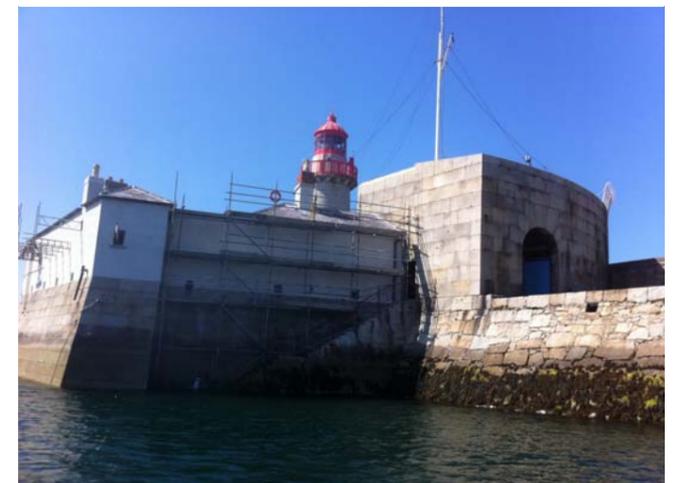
(above): Recent works to the East Pier Battery included repairs to the roofs of buildings and external lime rendering.
